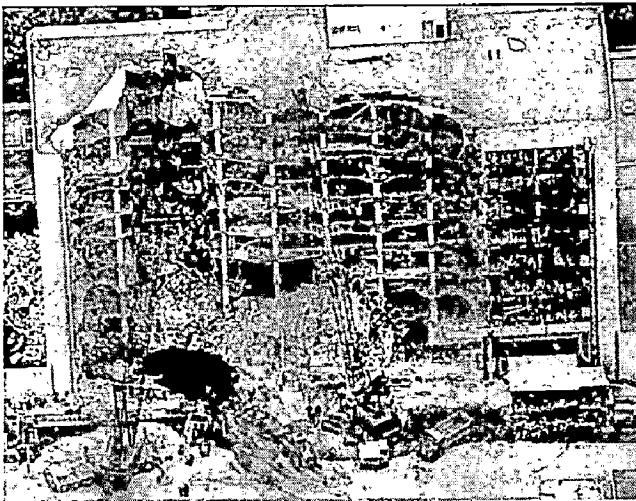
The front wall of the Alfred Murrah Federal Building in Oklahoma City damaged by blast.
